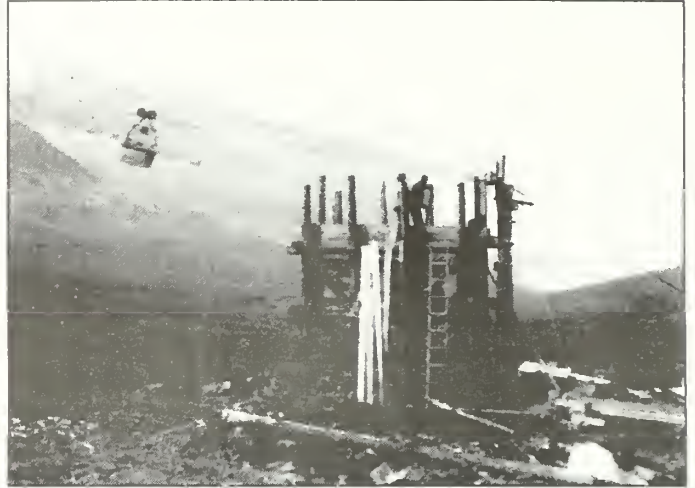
(top left). Yellow Band aerial tramway, completed in 1938. Photo looking northwest toward Golconda Creek. Tents of the lower camp are just visible at photo center. Photo courtesy of Sylvia Baldwin.
